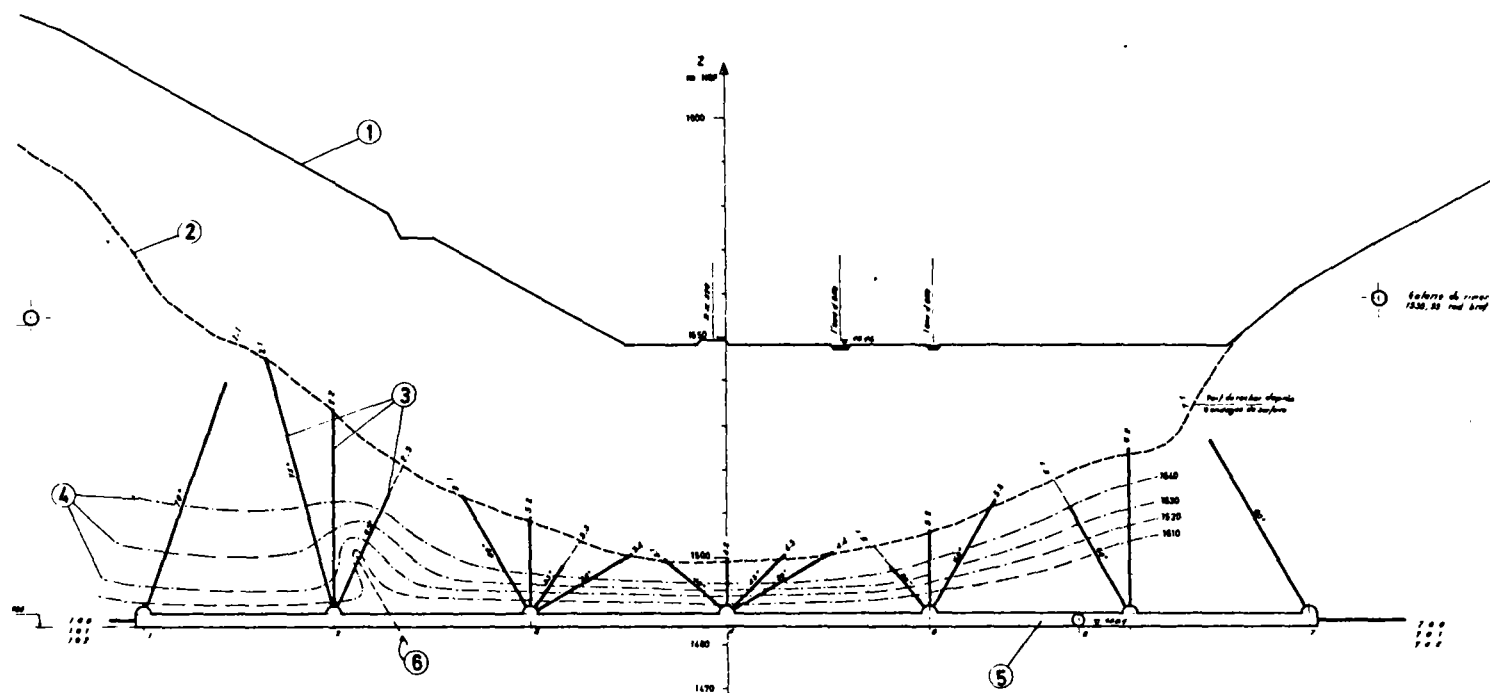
Piezometric campaign in the sub-fluvial gallery - Transversal vertical cross-section
